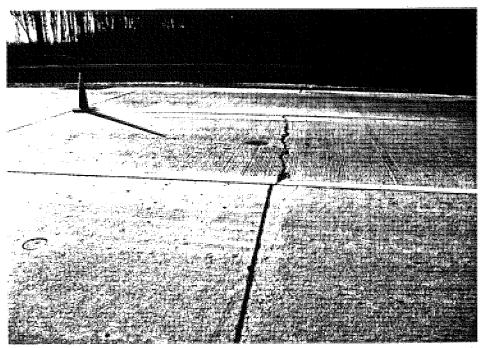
Typical crack pattern in section MI 1-3, recycled concrete on 5% cement-stabilized peastone base course.
